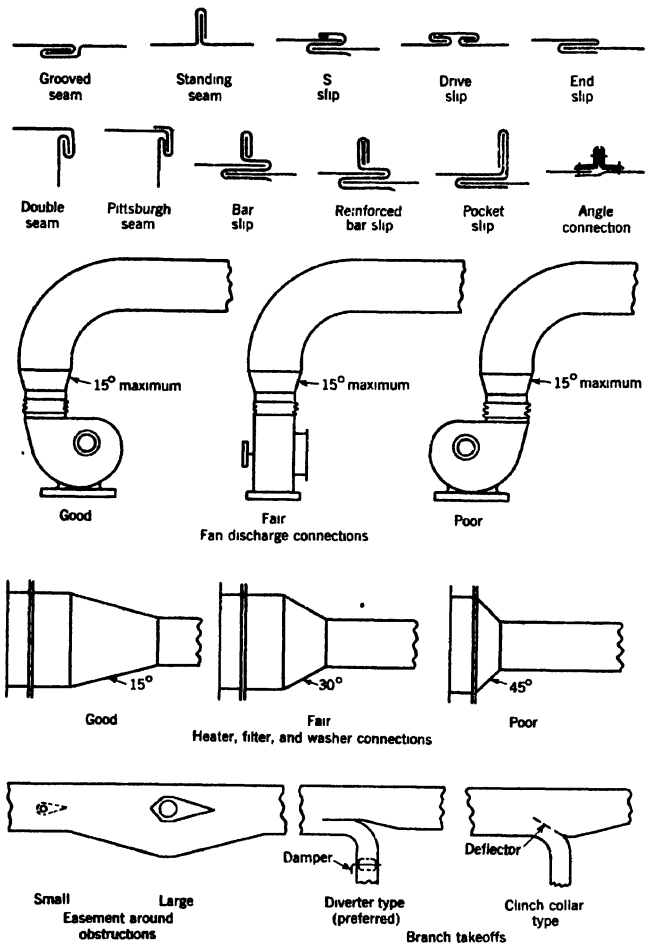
SHEET METAL DUCT AND ARRANGEMENT DETAILS
